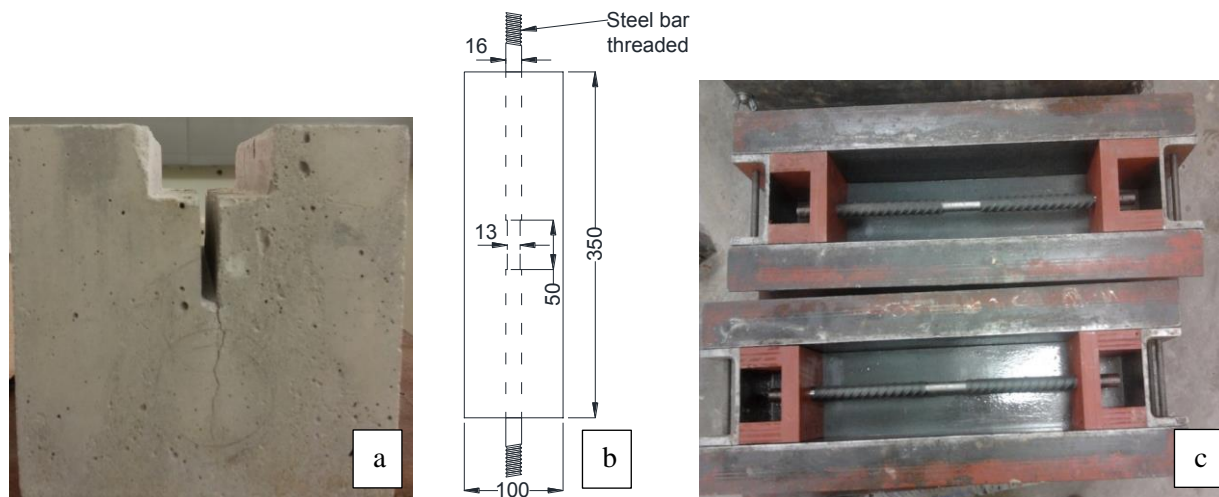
Test specimens, a. Wedge splitting specimens, b. Beam details and c. Prepared moulds for beam specimens.
